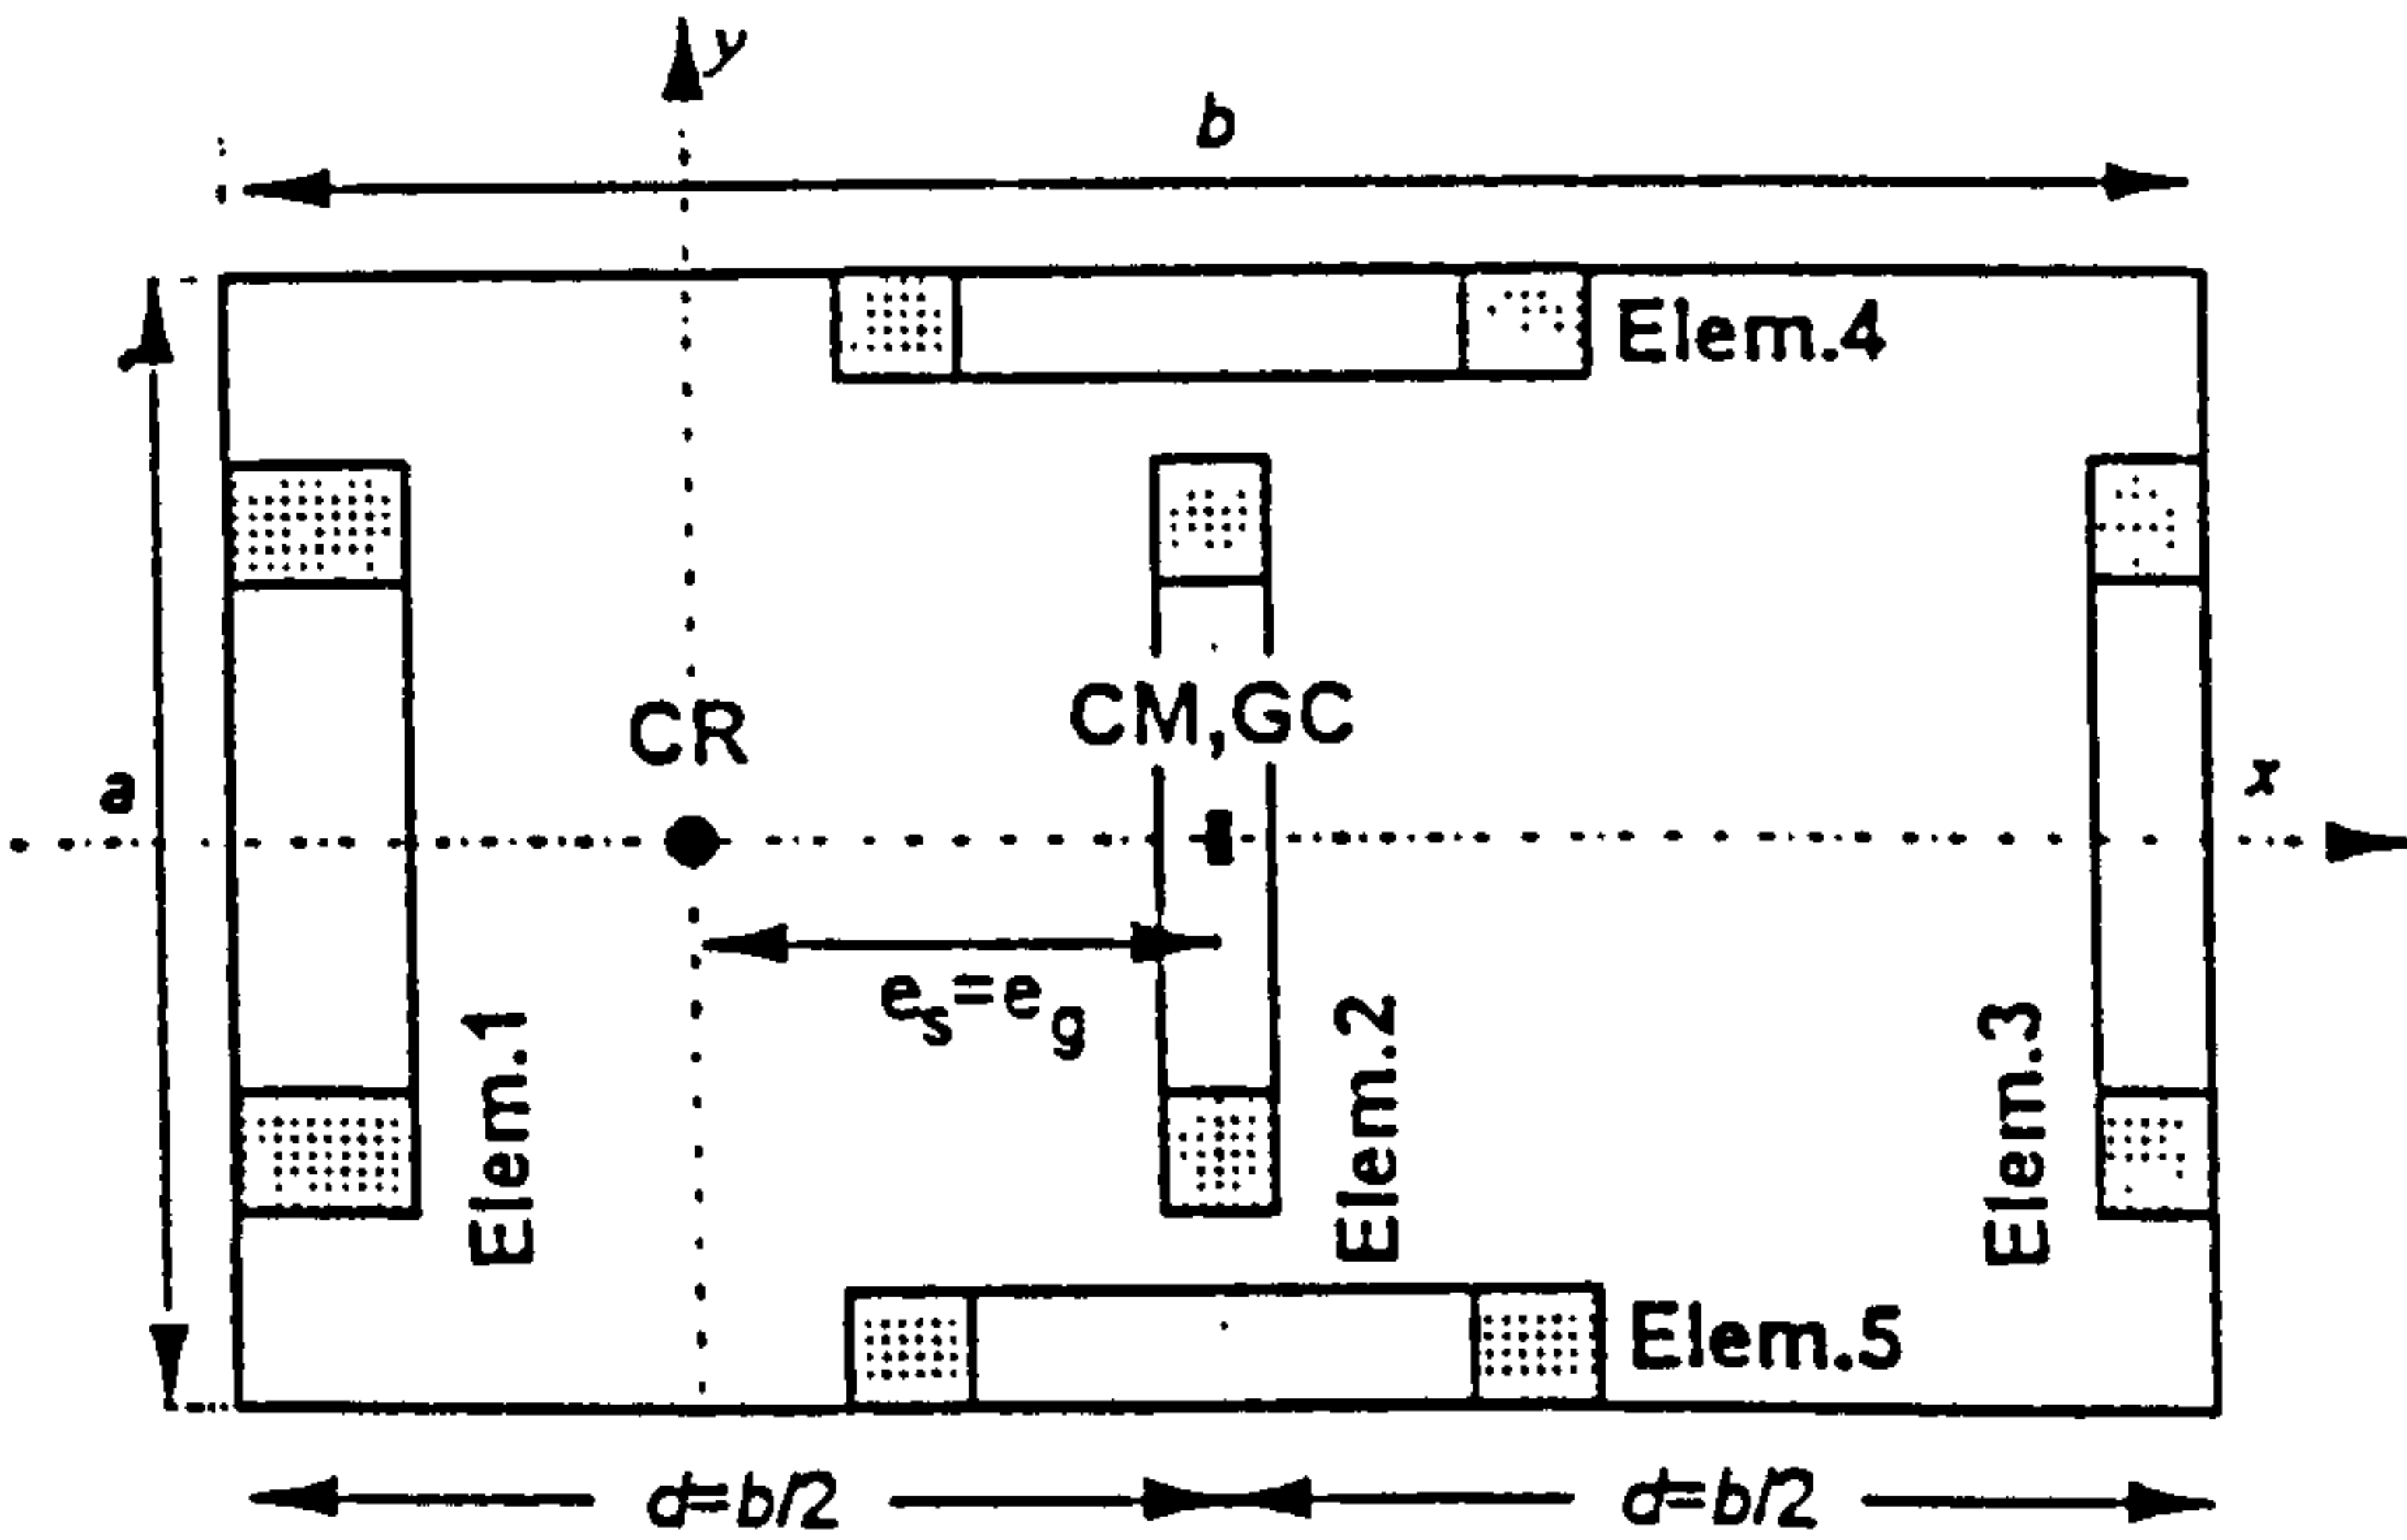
Structural plan configuration of a typical 3-element model with transverse elements (Correnza, 1994).
